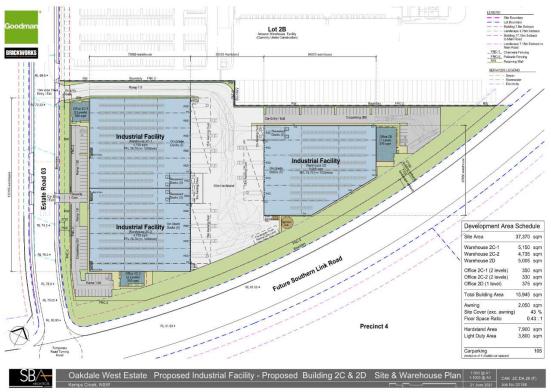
Originally proposed site layout Buildings 2C and 2D (Source: SBA Architects)
